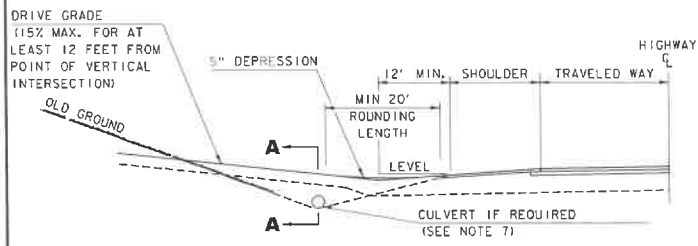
DETAIL D TWO-WAY UNDIVIDED COMMERCIAL DRIVE
